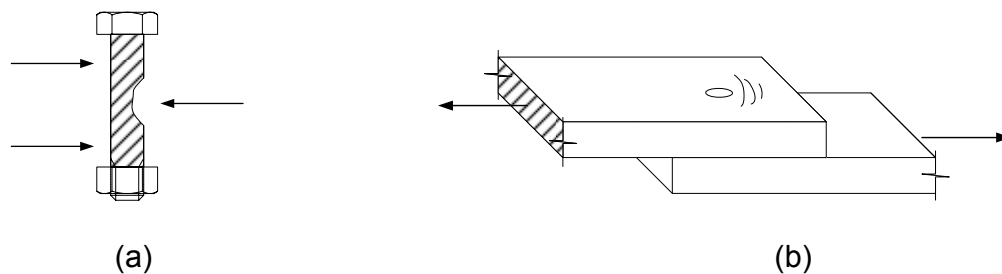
Bearing Failure of Bolt and Connected Material
